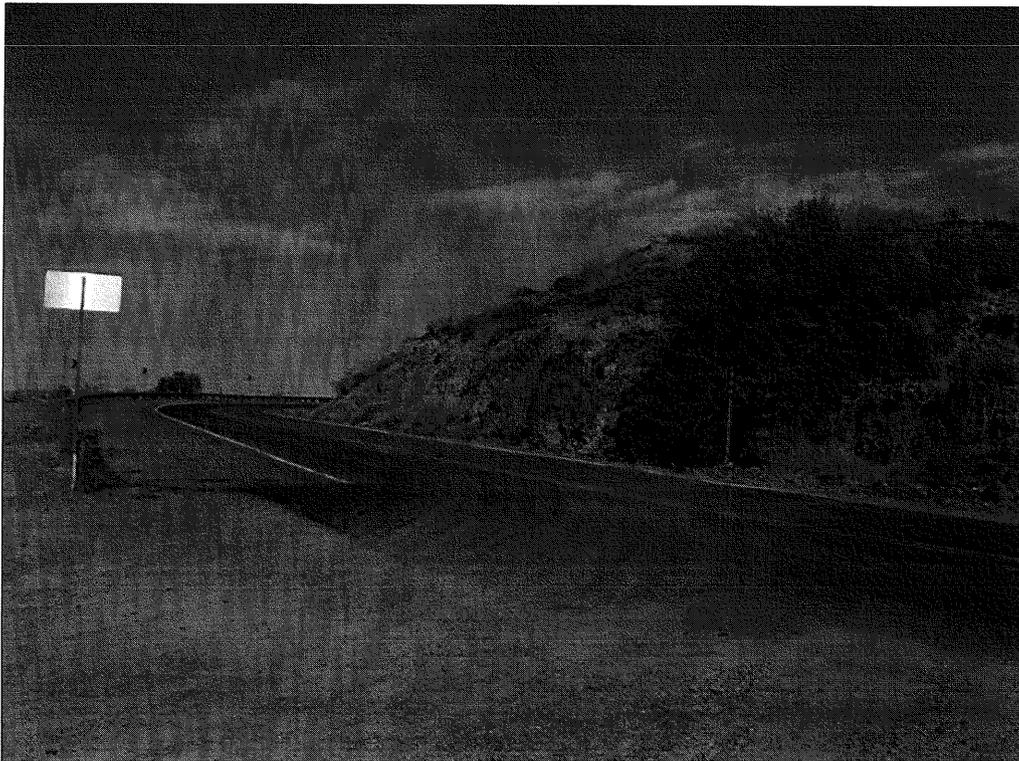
Eastern portion of Roadcut 1 along Road Segment 3, AZ FF:9:17(ASM), facing northwest.
